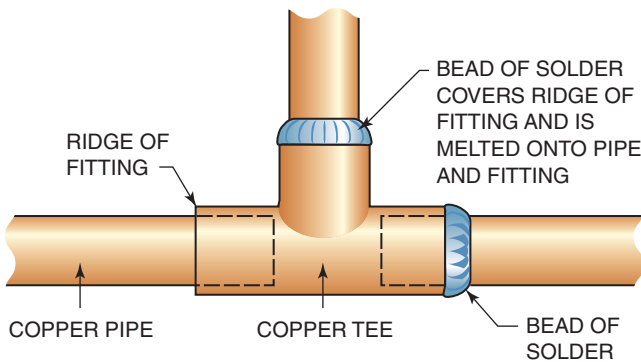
A brazed copper joint should have a uniform bead along the ridge of the fitting.
